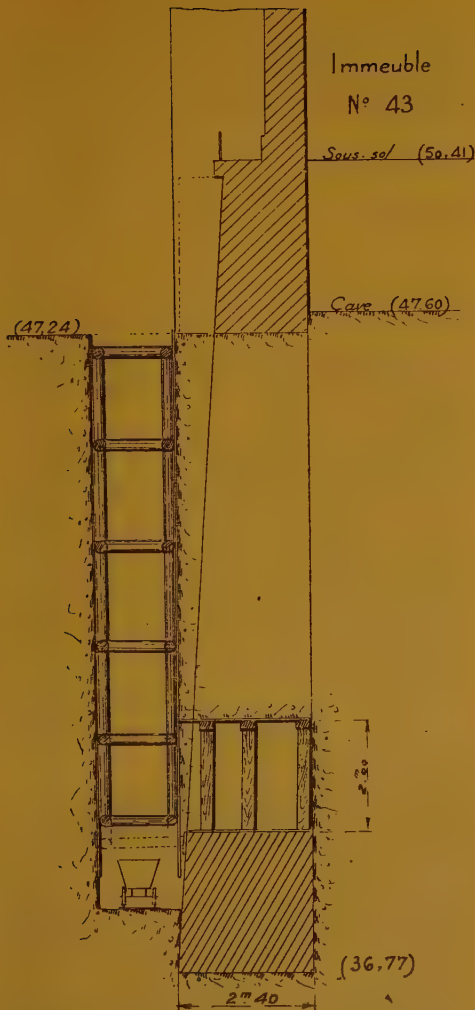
Under-pinning of foundations of No. 43, Boulevard des Batignolles. — Section through AB on figure 36.
